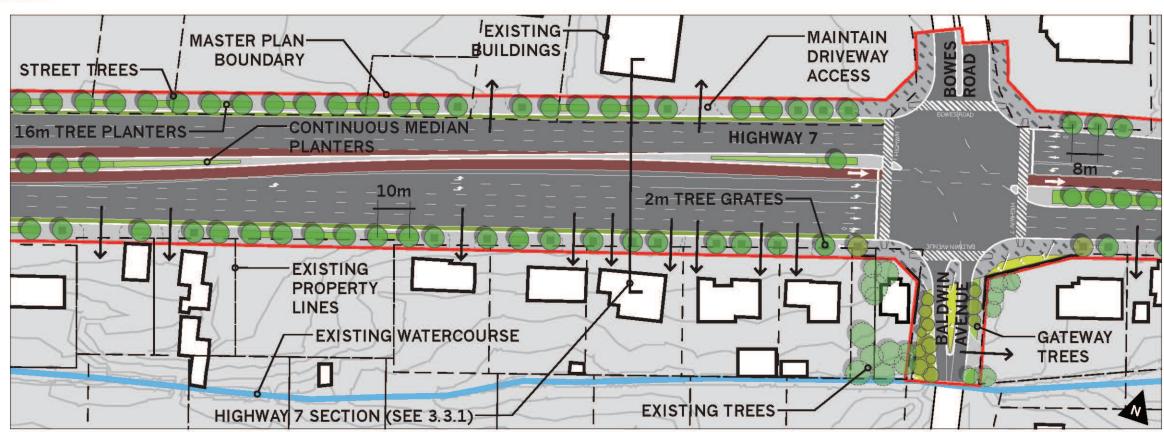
Highway 7 streetscape concept plan detail.
